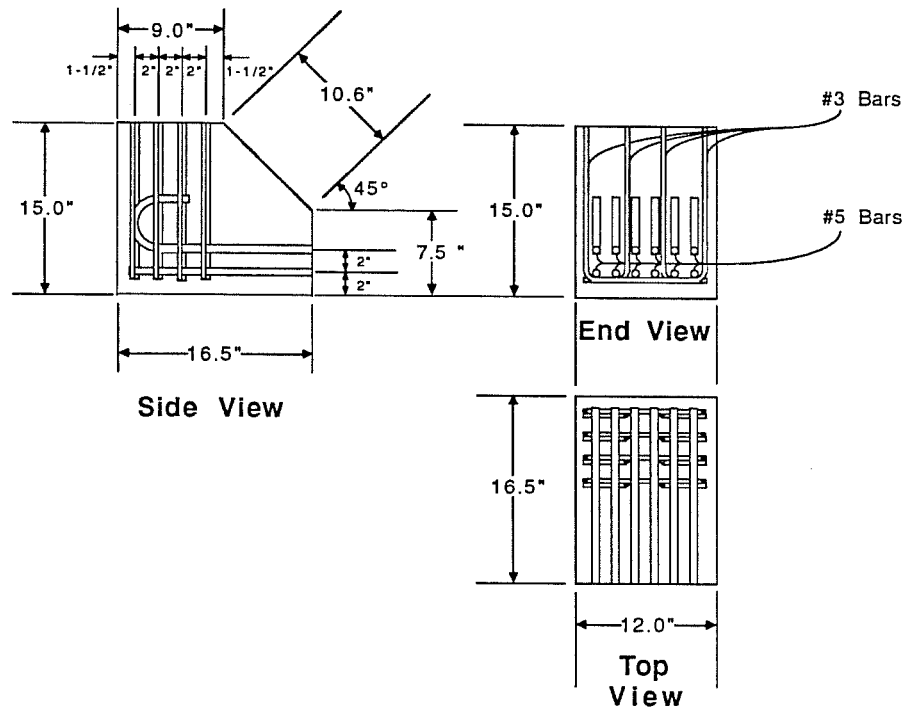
Geometry and Placement of Steel for Specimen LFAC
